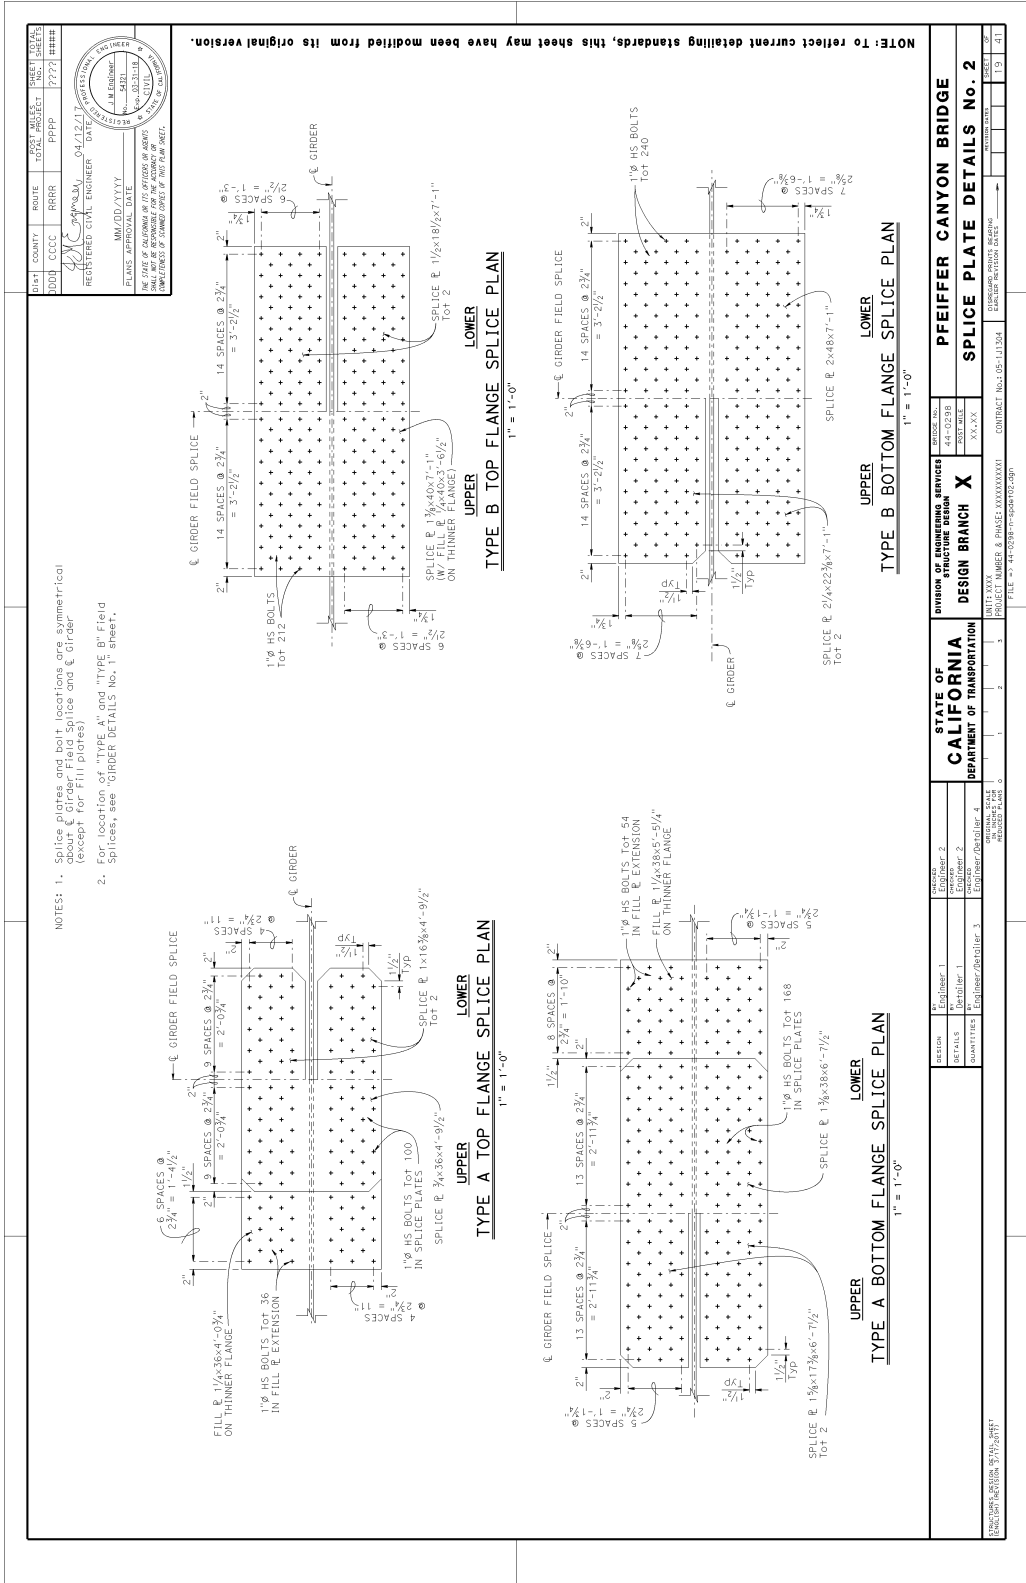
A.A.5 Steel Girder Bridge Detailing Example 5
